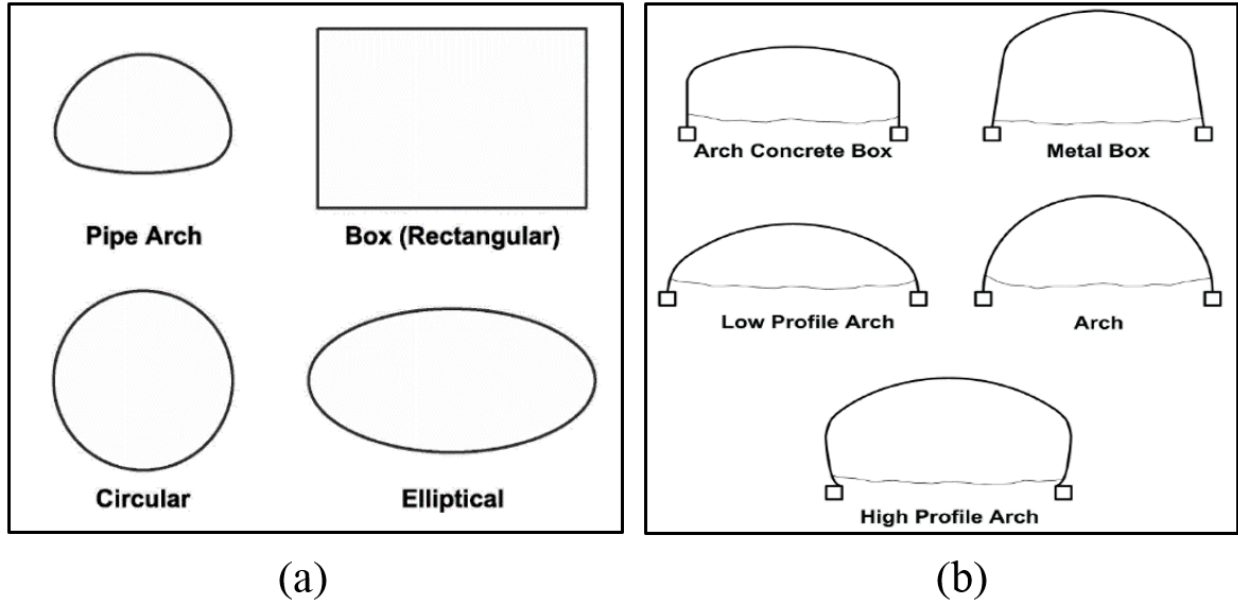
Different shapes of culverts: (a) closed conduits, and (b) open-bottom conduits (FHWA 2012).
